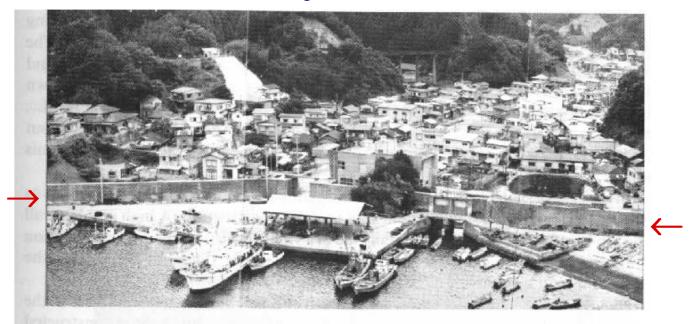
Typical fishing village, (Ryoishi), on the Sanriku coast.
